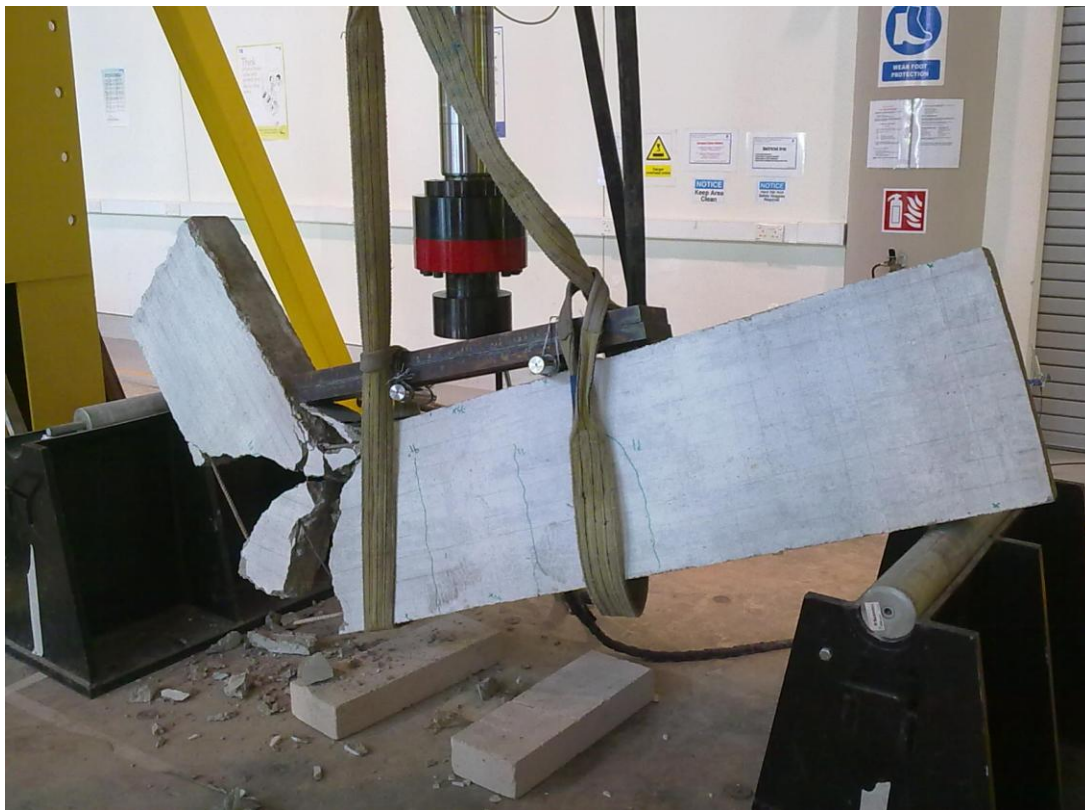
Failure of Solid Beam subjected to Cyclic Load
